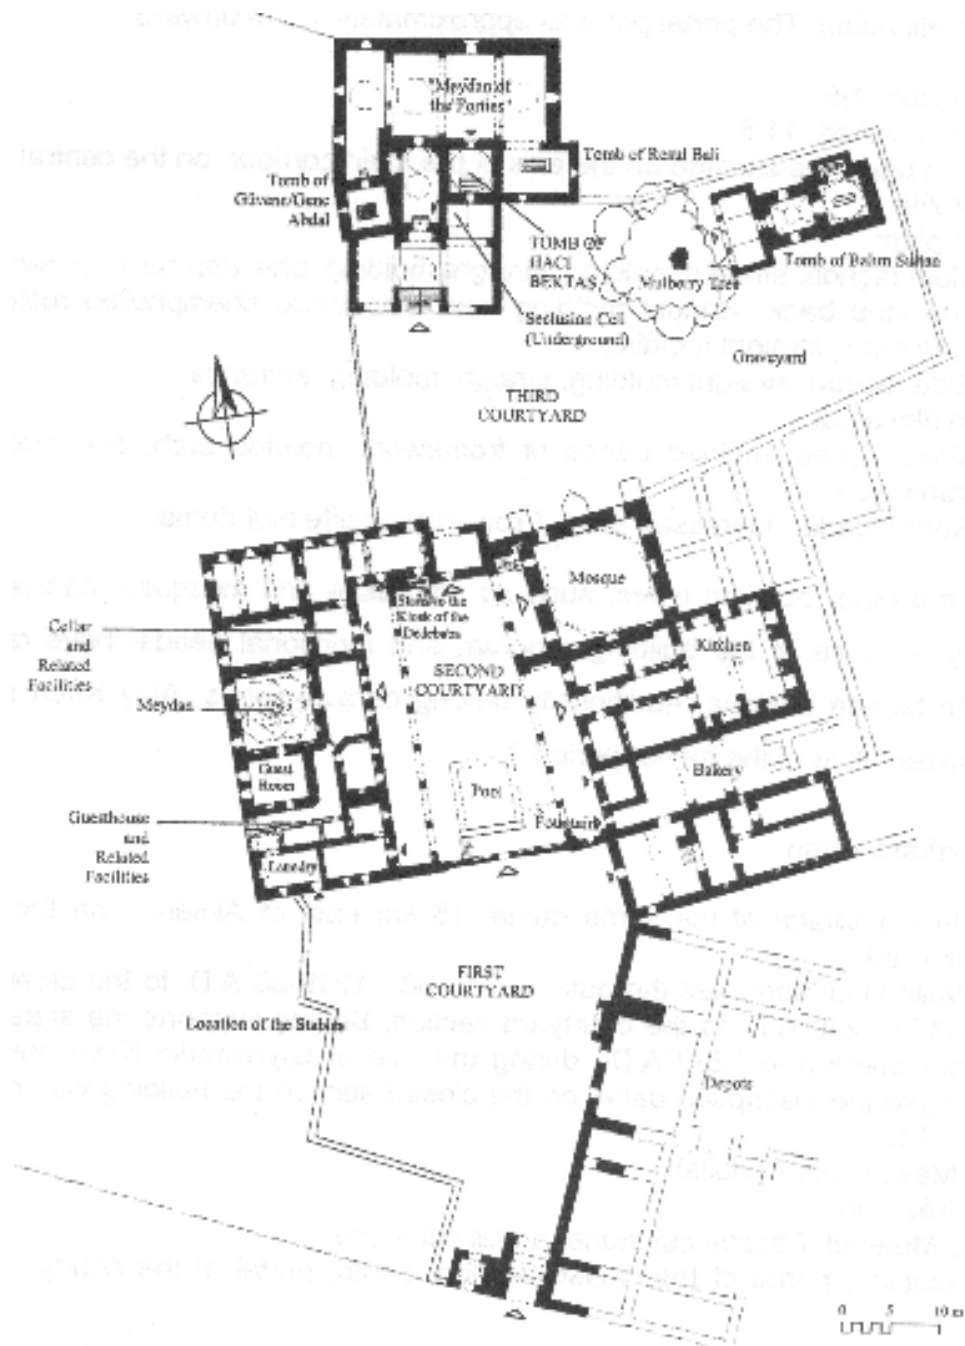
2 Site Plan of Hacı Bektaş Lodge
